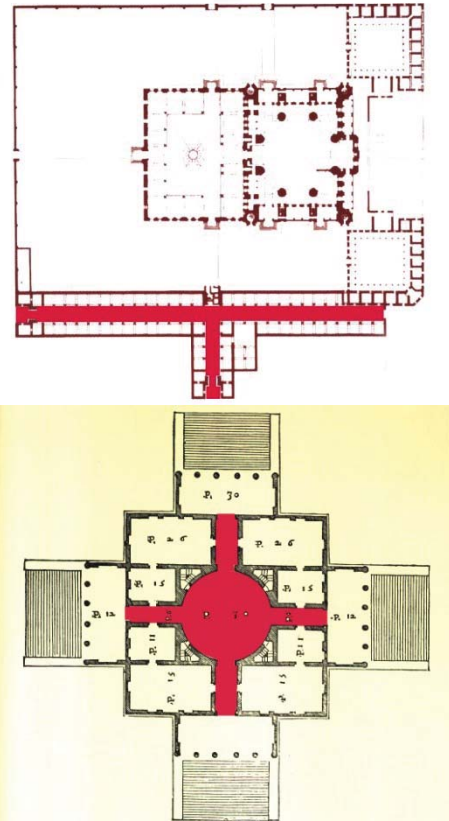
Selimiye Külliyesi, Architect Sinan, Edirne, 1568-1574; Villa Rotonda, Andrea Palladio, 1552-1567
